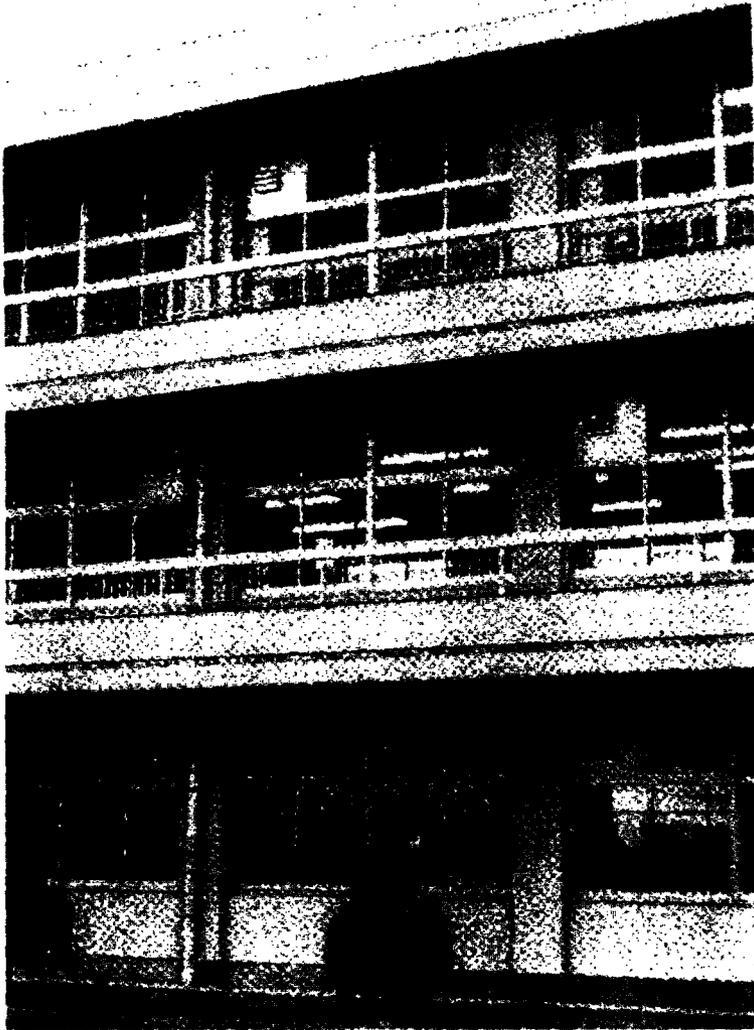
Izumi High School, typical classroom building, south face. This side of the building, which is relatively open, suffered little damage.
